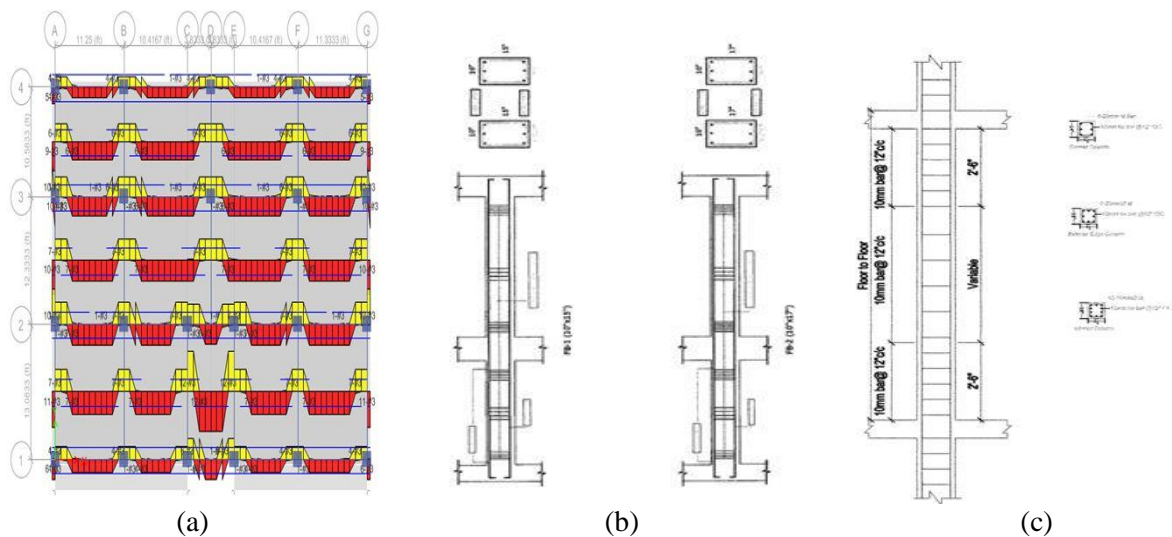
(a) Moment Diagram of Slab (b) Beam Reinforcement Detail and (c) Column Reinforcement Detail
